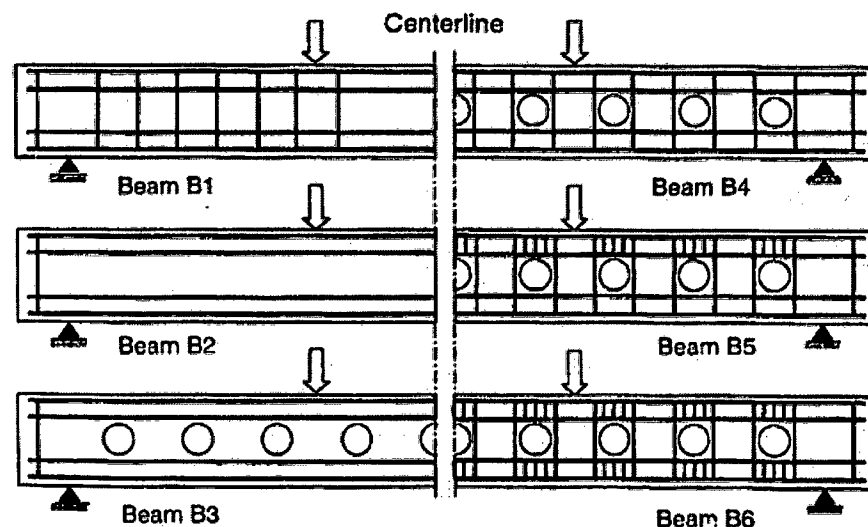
Reinforcement schemes for beams with opening (Salam, 1997).
